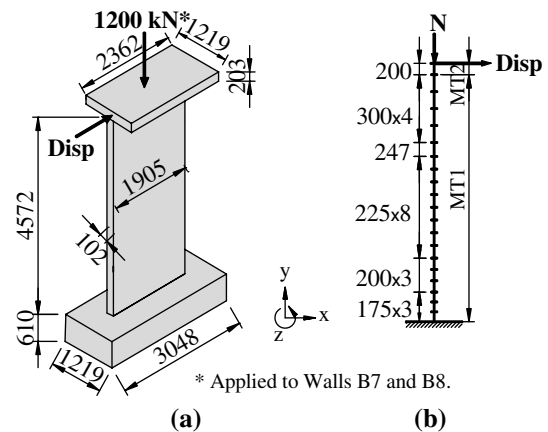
PCA walls: (a) typical view (with rectangular cross section); (b) frame model
